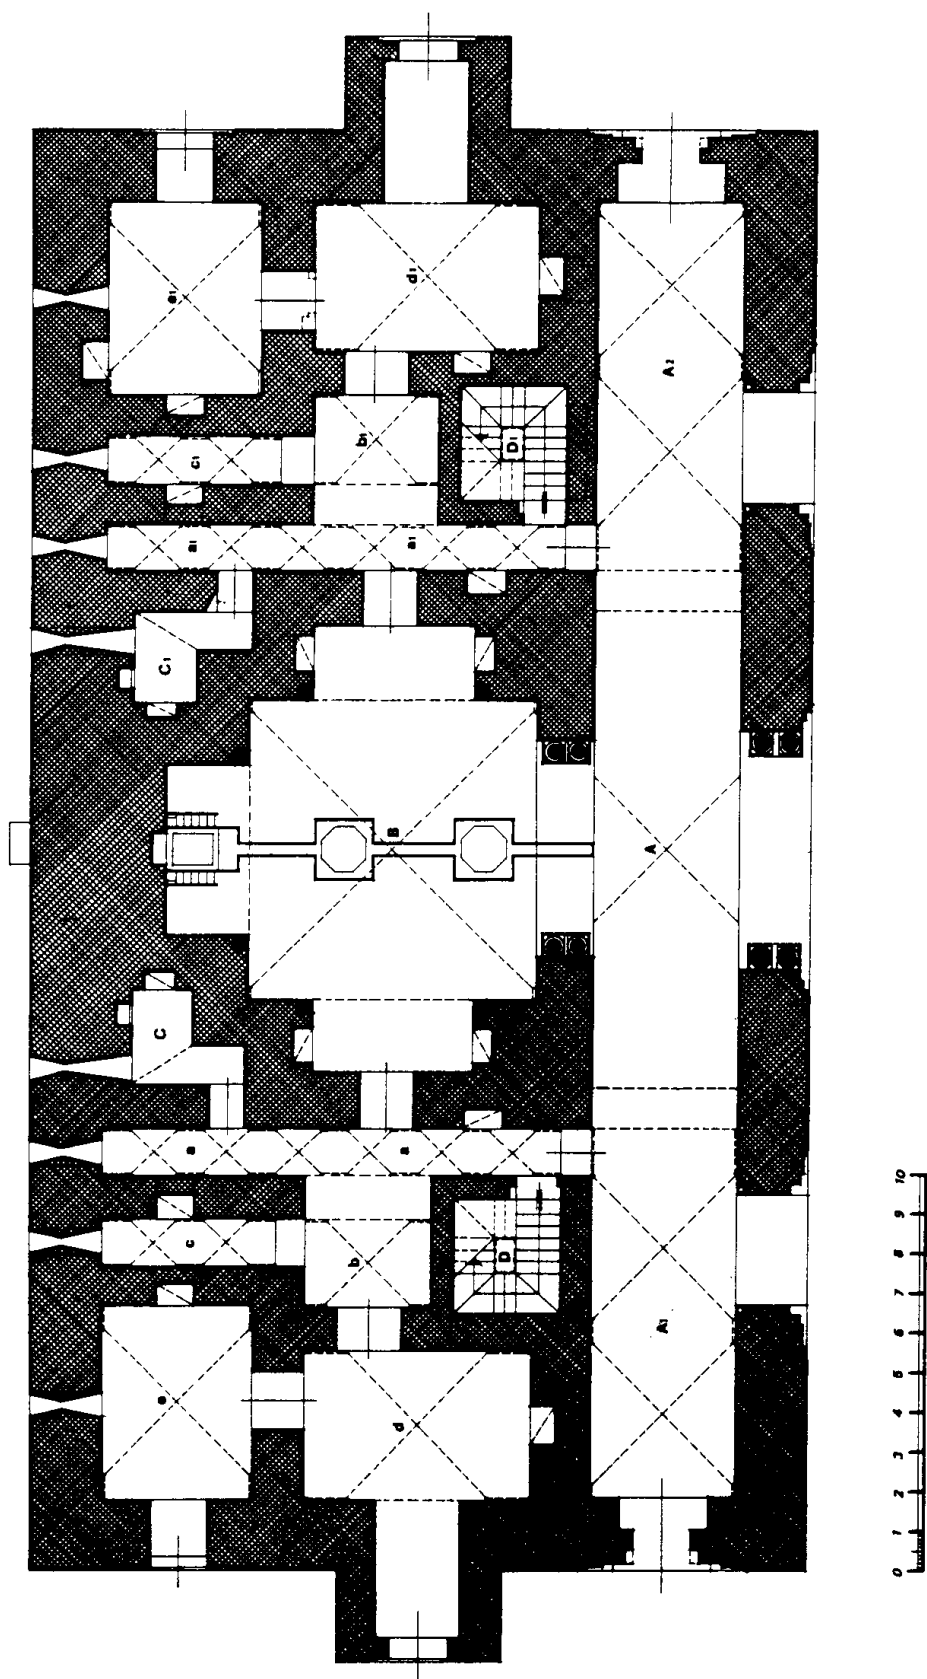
Palermo, the Zisa: ground plan (after Bellafigliore)
